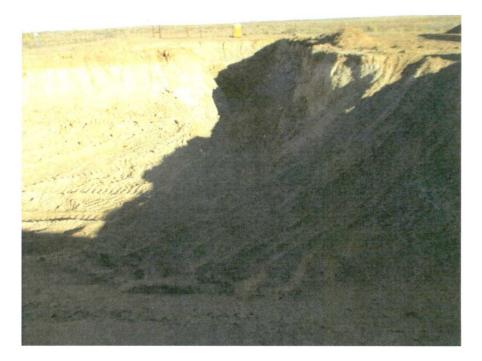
Final North excavation LACT area. Photo taken by Blagg Engineering on November 26, 2018.
